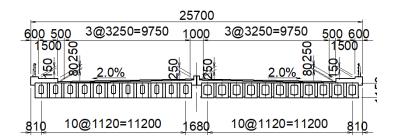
Typical Width of Planned Palmeraie Road
